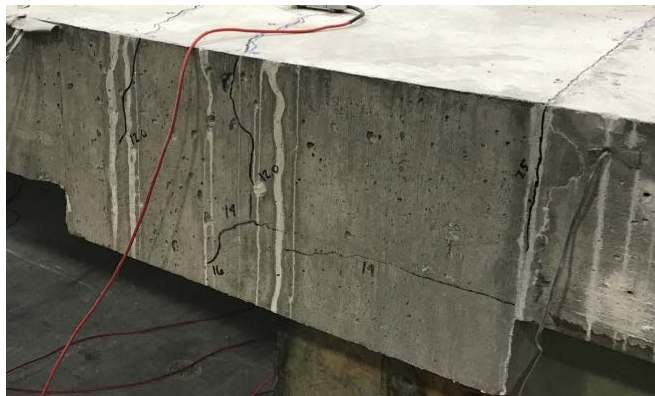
Cracking occurring in concrete diaphragm section at intersection with steel girder, Test 1.
